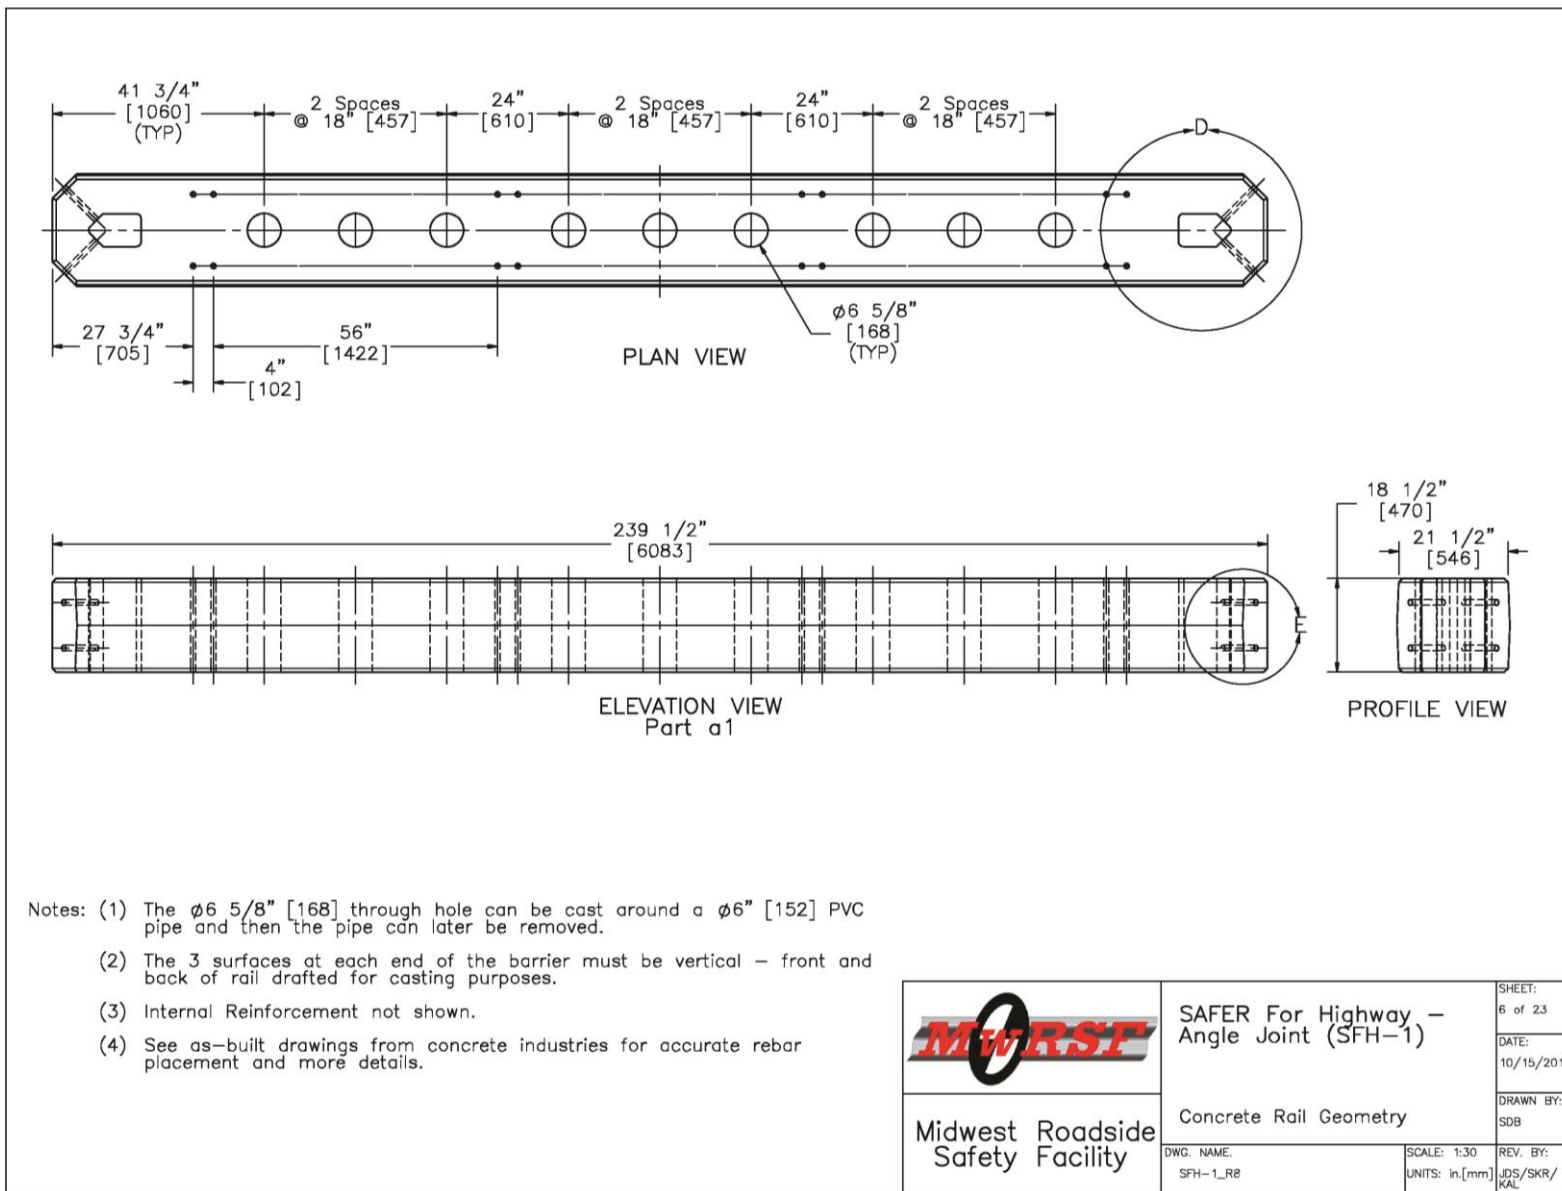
Recommended Barrier Design for Full-Scale Crash Testing, Concrete Rail Geometry
